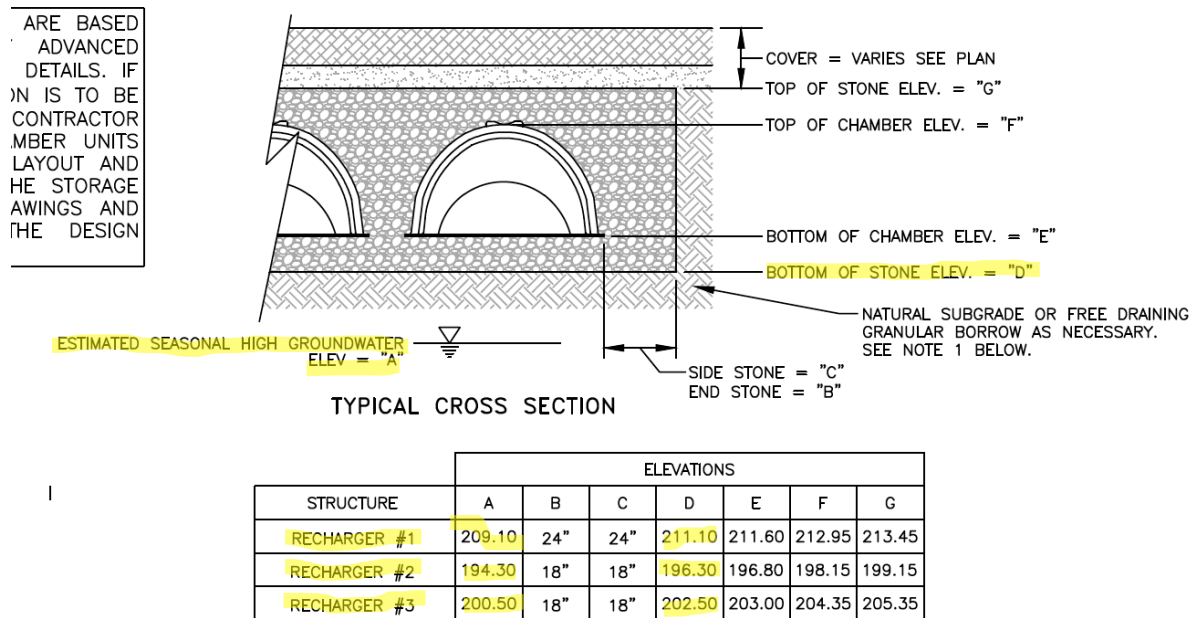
Engineering design elevations for proposed stormwater infiltration systems (Source: DGT Associates, Site Plan, Sheet C-15, revised 9/19/24)
